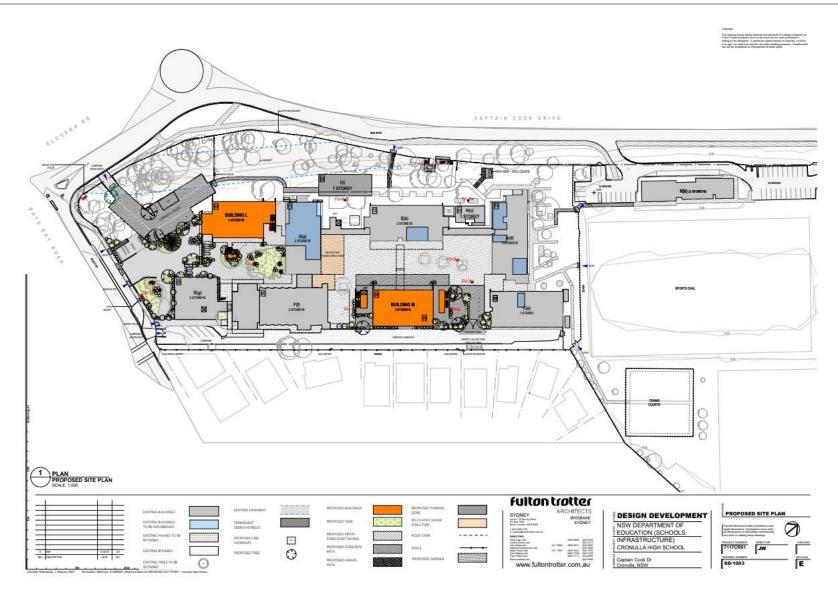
Proposed development, refurbishment and layout 31 Bate Bay Road, Greenhills Beach (Fulton Trotter Architects 2023)
